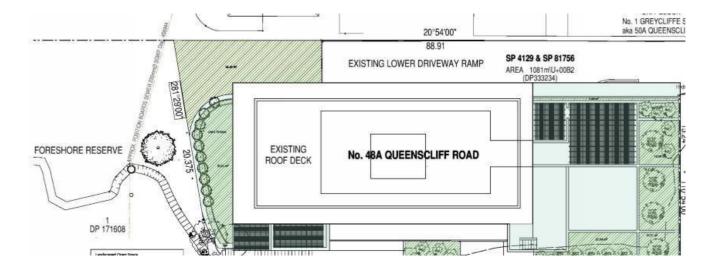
Site Plan (Source: Architectural Projects, 2016)
